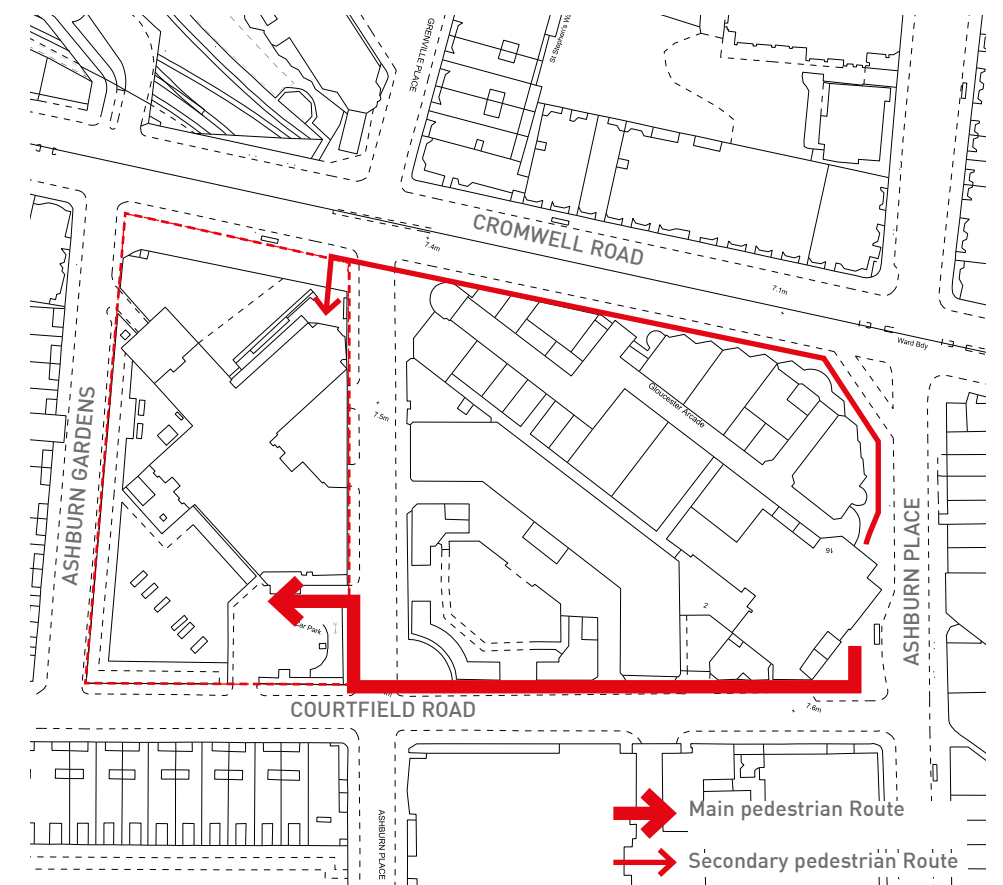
Existing plan describing pedestrian routes between station and the site
